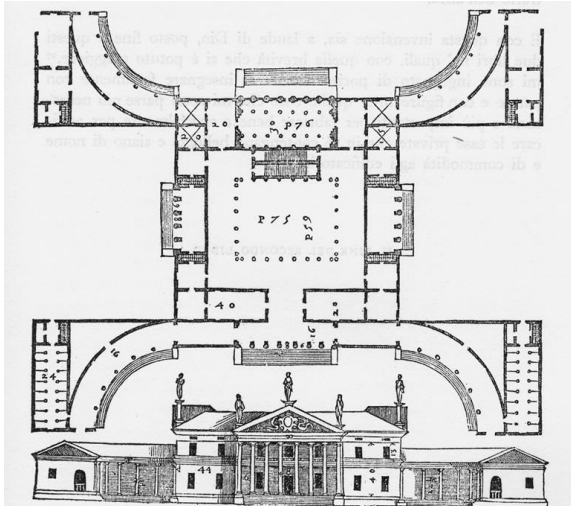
(left) Andrea Palladio, Floor plan and elevation of Villa Mocenigo sopra la Brenta, 1560-1564
